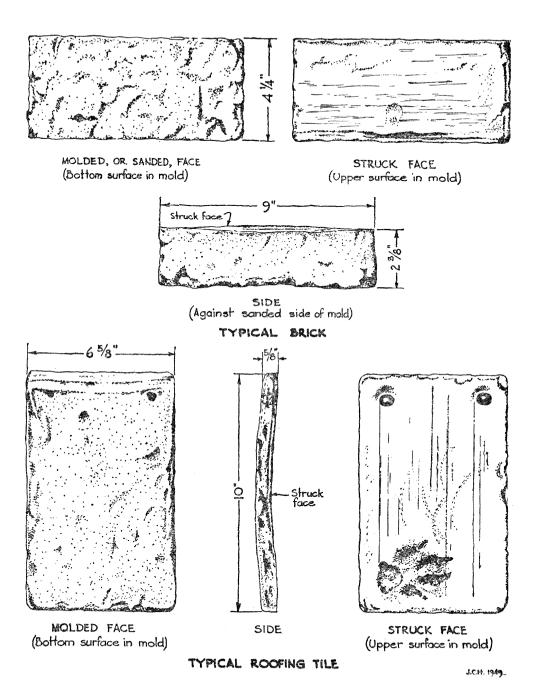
Typical brick and roofing tile from Brick Kiln "B."
